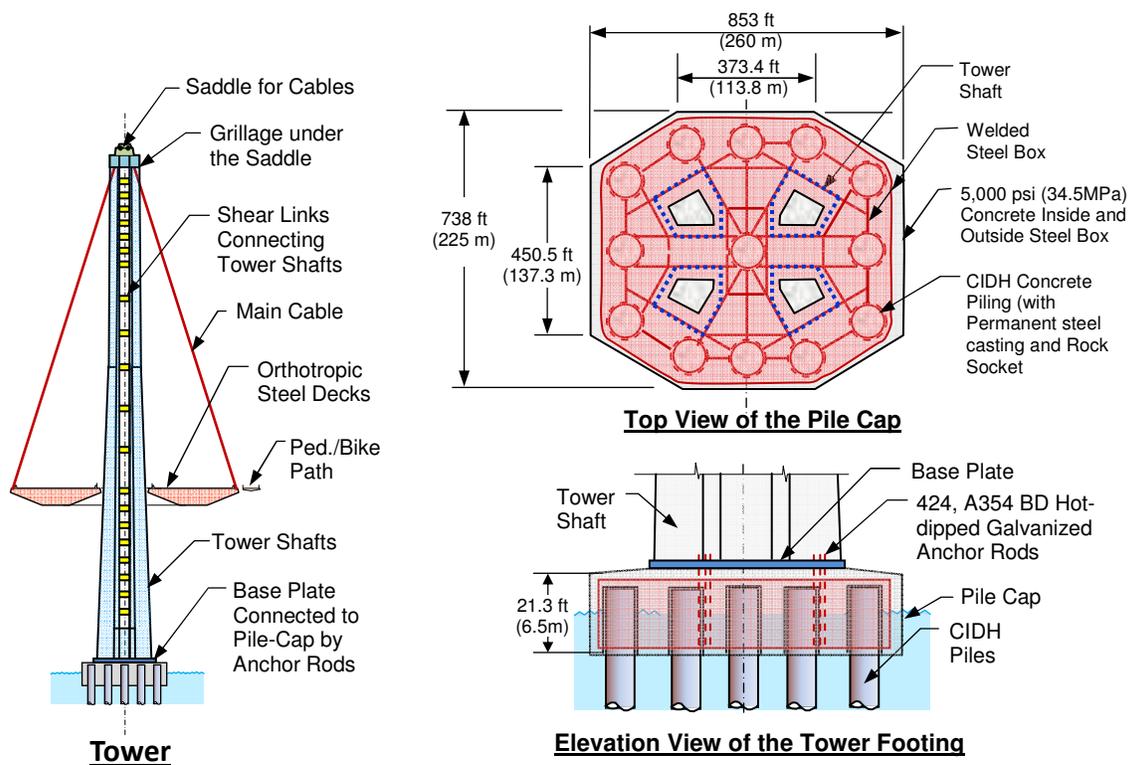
Elevation of the Tower (left) and Plan and Elevation of the Pile Cap Footing Supporting the Tower
